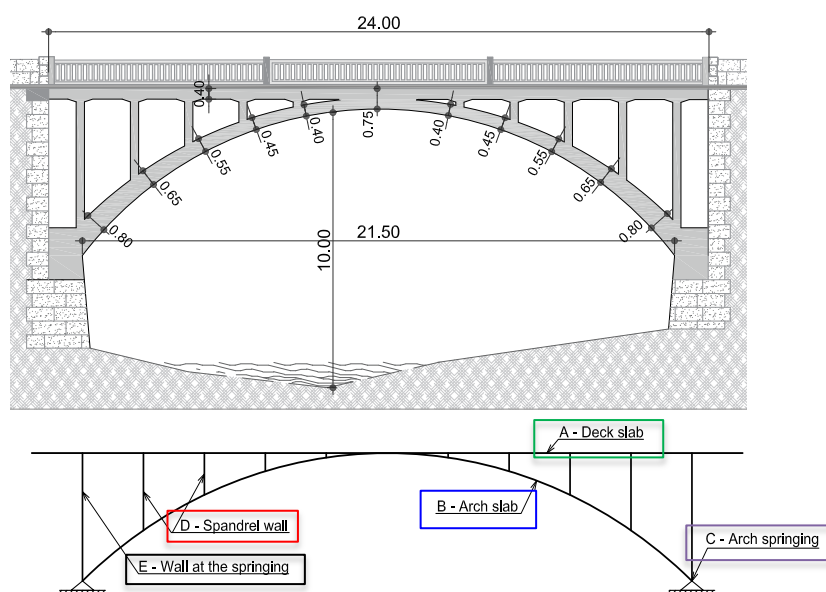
Longitudinal section of the bridge (top) and simplified structural system (bottom)
